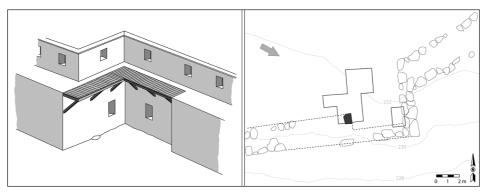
The corner and the nearby curtains as an open space. The ikria would have covered the stretch with narrower wall in the corner. Also included in the drawing are the trenches excavated in 2008. The large block found is marked with a dark colour.
